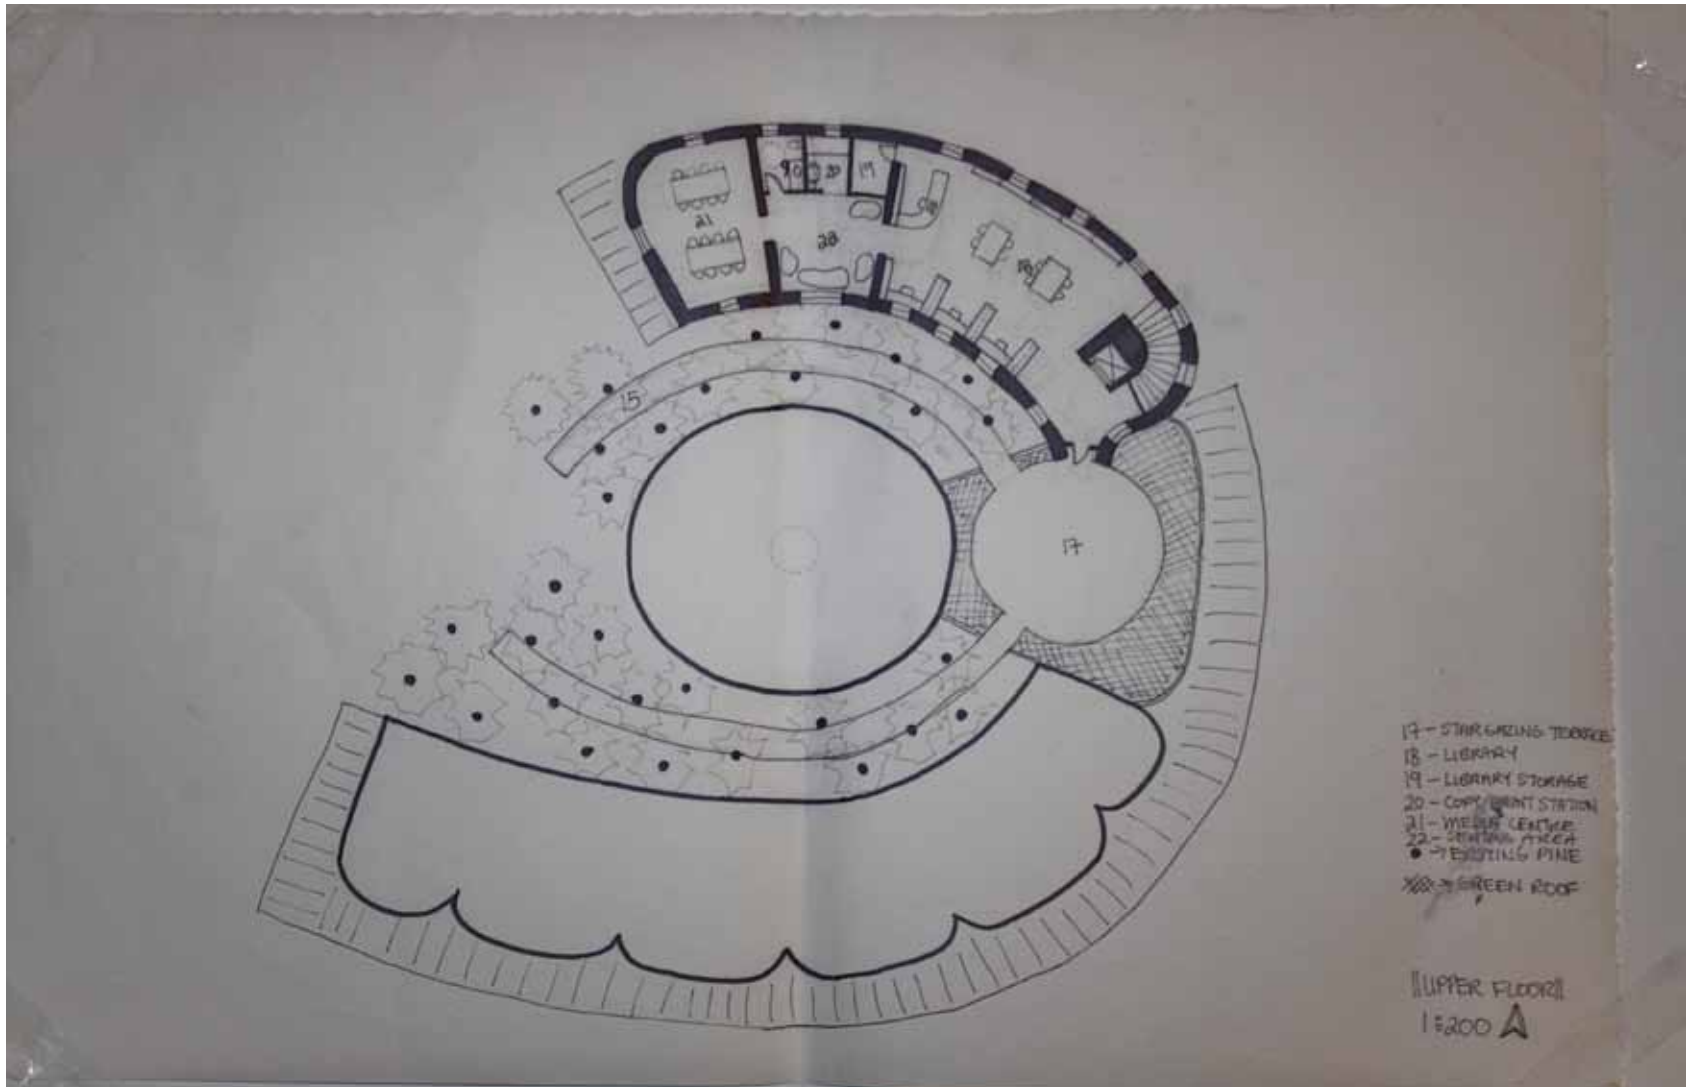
Sixth iteration: Upper plan with gathering space separated from main building allowing more light, connection to nature and clear structural system
